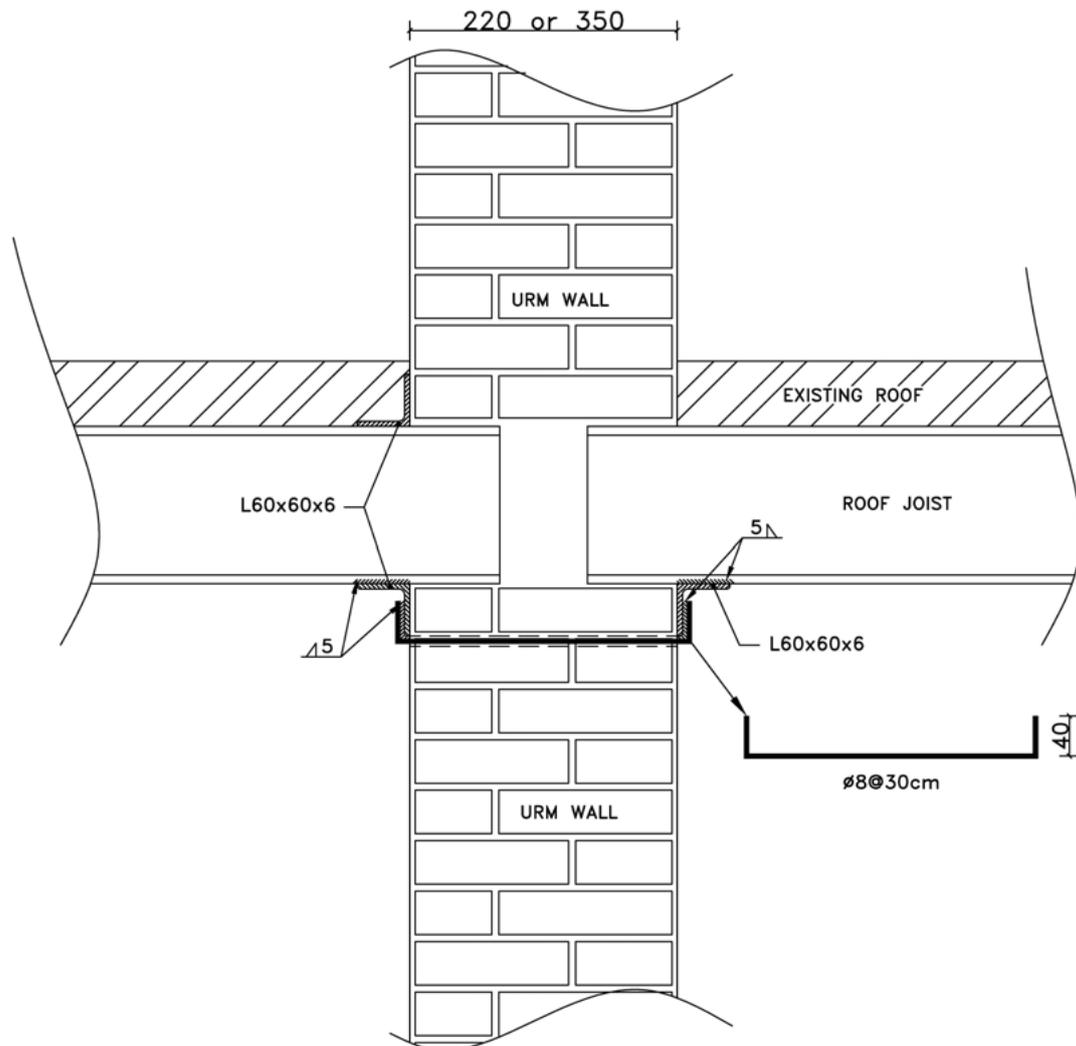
Adding an  $60 \times 60 \times 6 \text{ mm}$  angle to connect the wall to the floor where the floor slab joists are perpendicular to the wall.
